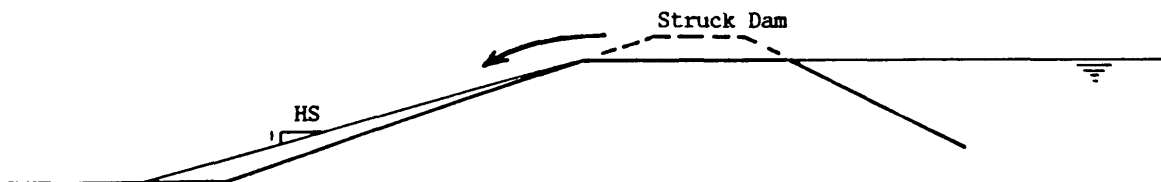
Case 1 Cross Section: Struck Dam Insufficient for Outside Filling
